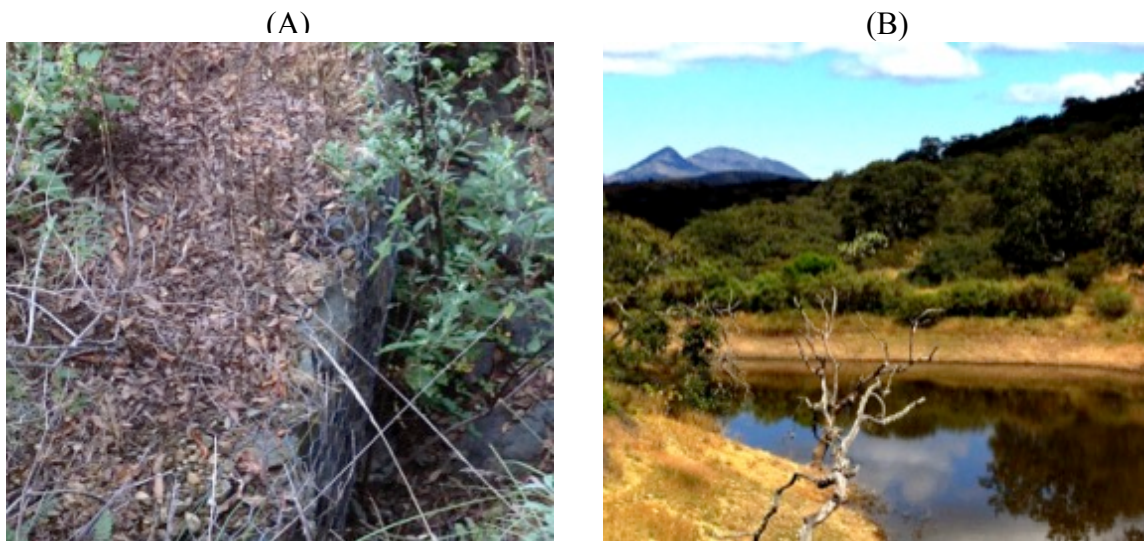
Water retention projects. (A) Looking down on a 10-year-old gabion installation constructed of chain link fencing and rocks. (B) water catchment pond surrounded by a reforested protected area. (Photos by the author)
